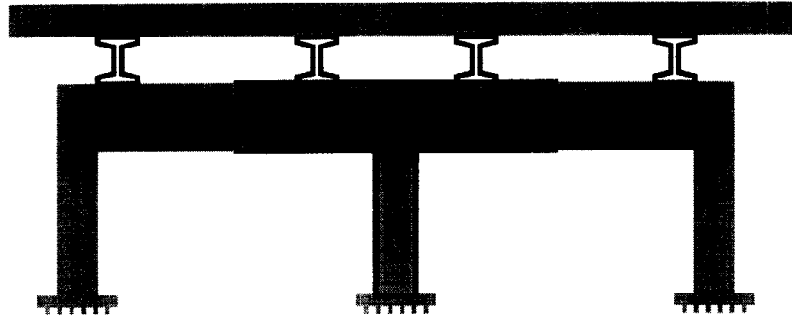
Prototype As-Built Bridge Frame and Experimental Test Sub-Assemblage
